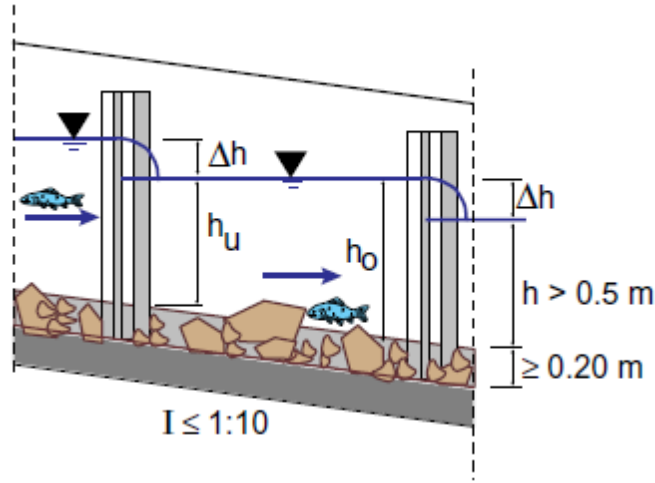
Detail of vertical slot pass (schematic longitudinal section) (DVWK, 1996).
